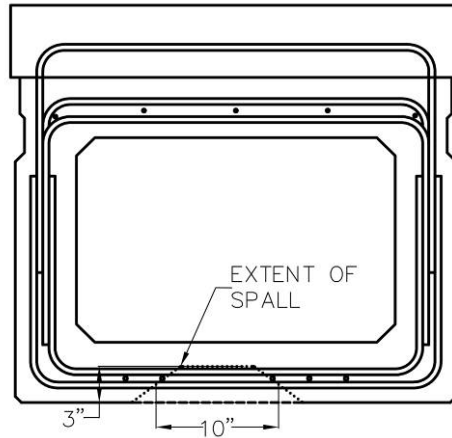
Elevation: prestressed concrete side-by-side box-beam bridge (Example A)
